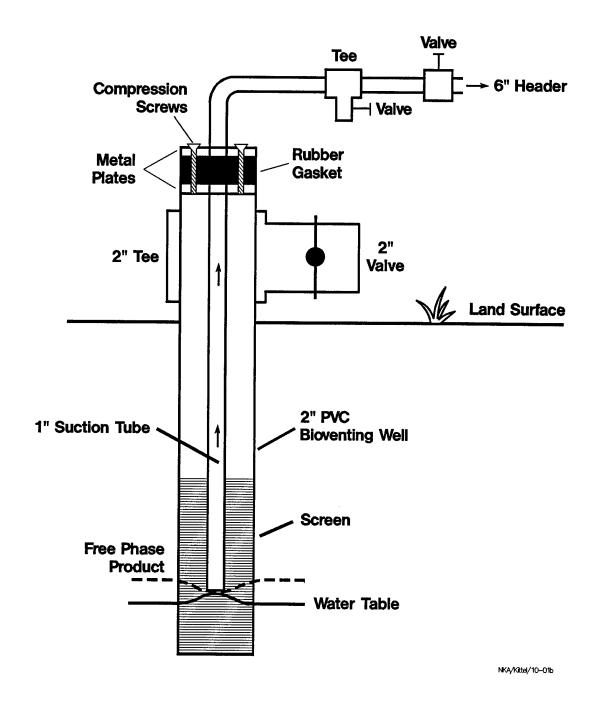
Slurper Tube Placement and Valve Position for the Bioslurper Pump Test
